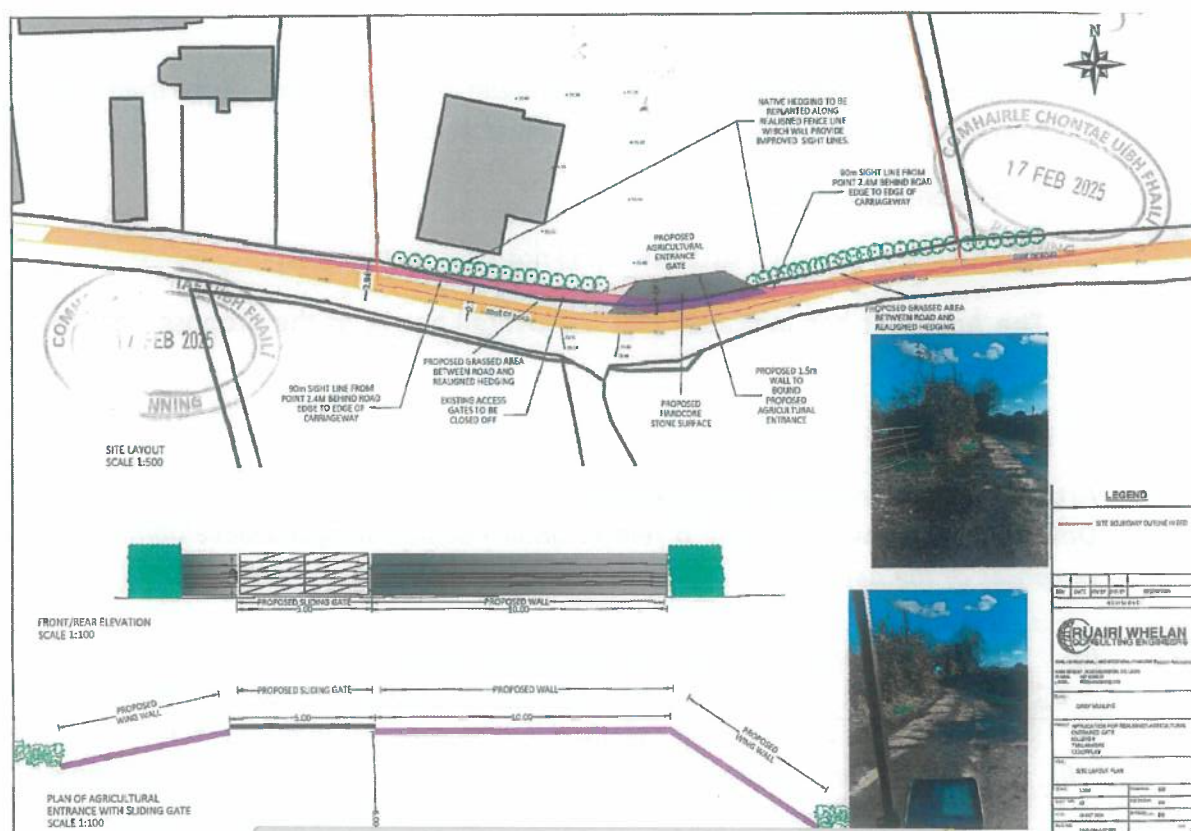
Proposed Site Layout and elevations of the revised entrance.
